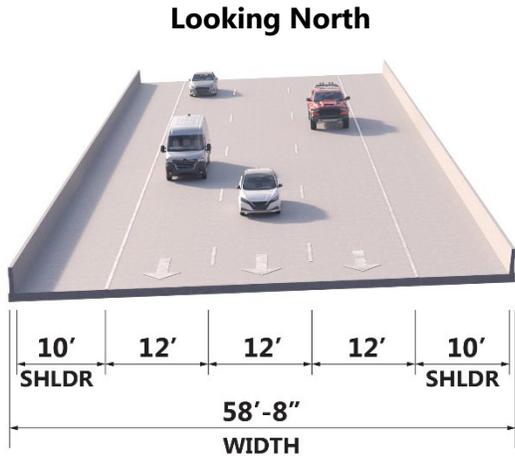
Proposed Southbound US 41 Bridge over SR 597 Typical Section
